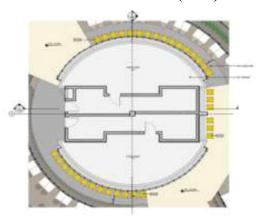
Food Court Modified Plan in Sitting Area in Mall of Oman (BIM)
